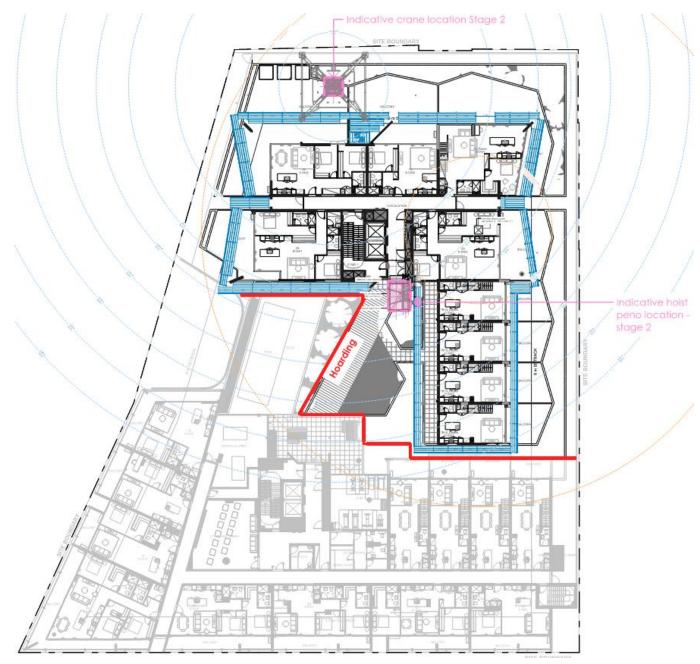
Proposed Hoarding and Scaffold Plan for Stage 2 Construction
